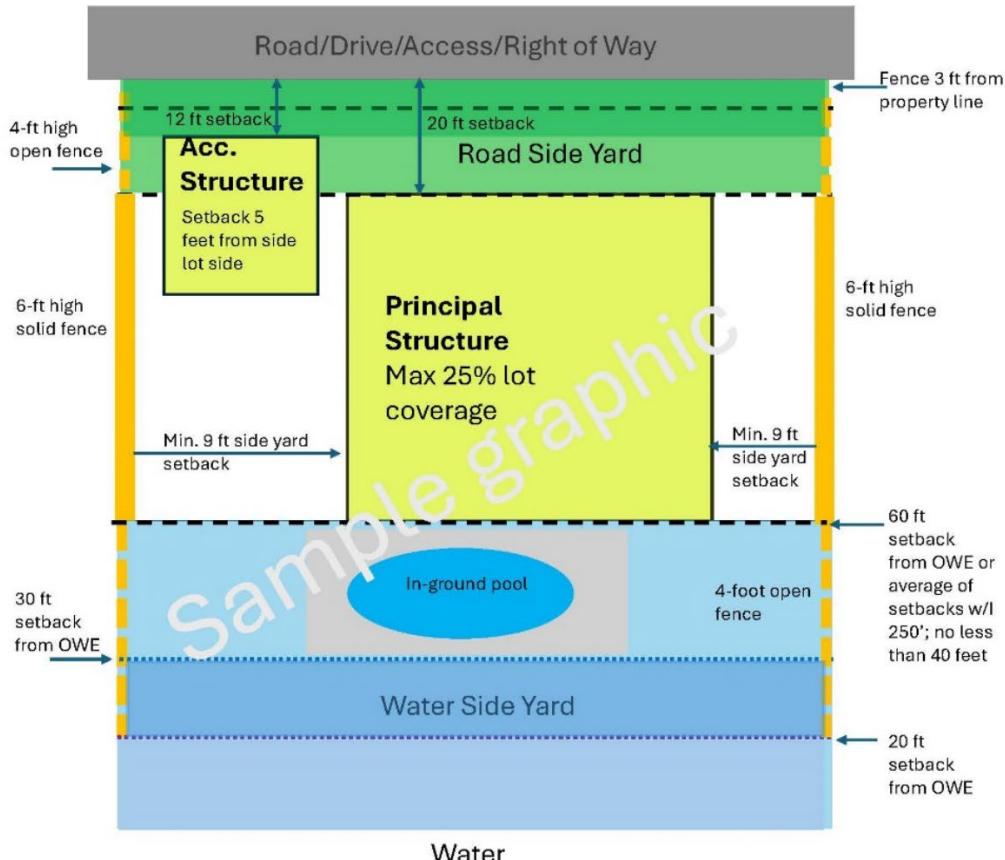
existing lot of record, with at least 109 or less feet of road/drive/access/right of way frontage
